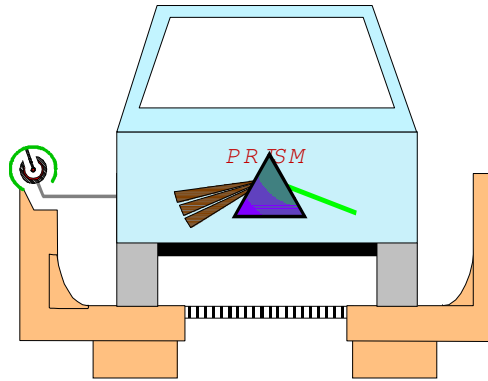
Cross-section of PRISM guideway showing shielded power supply cable and open gridwork between the tire strips
